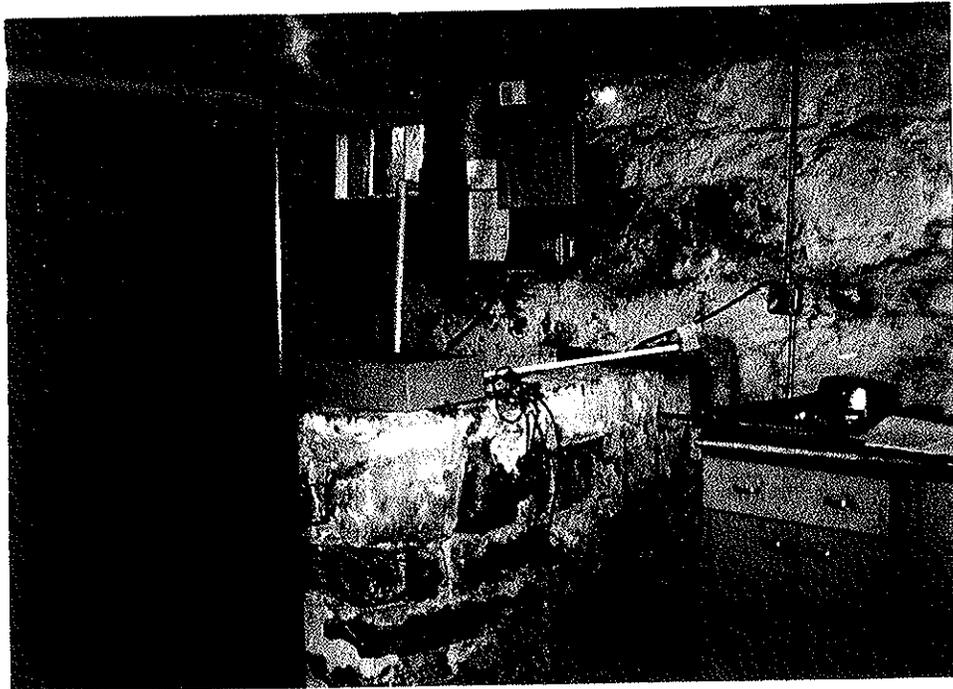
Weir House Basement - Southeast Room [Room 003], Looking Southeast, Stone Half-Wall (1994).
